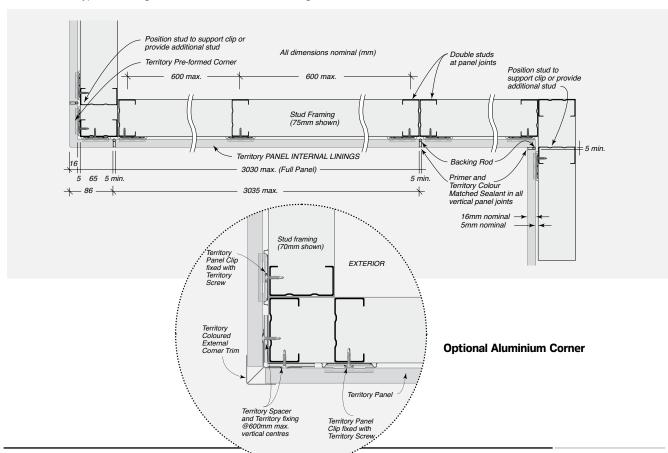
Typical Framing Set-Out with 75mm Steel Framing and Pre-formed Corner - Plan View
